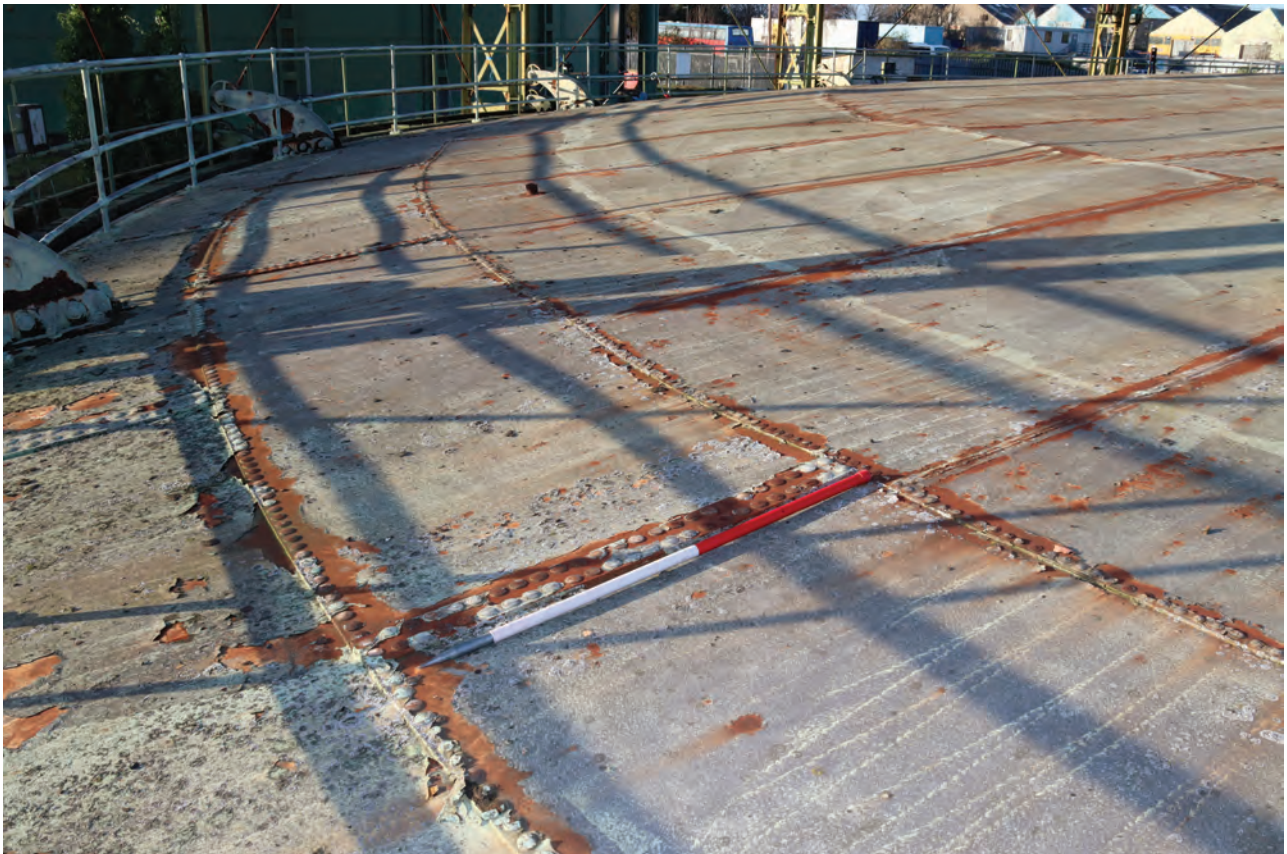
Gasholder No 1, general view of the south side of the crown showing riveted and welded sheets, from the ESE
